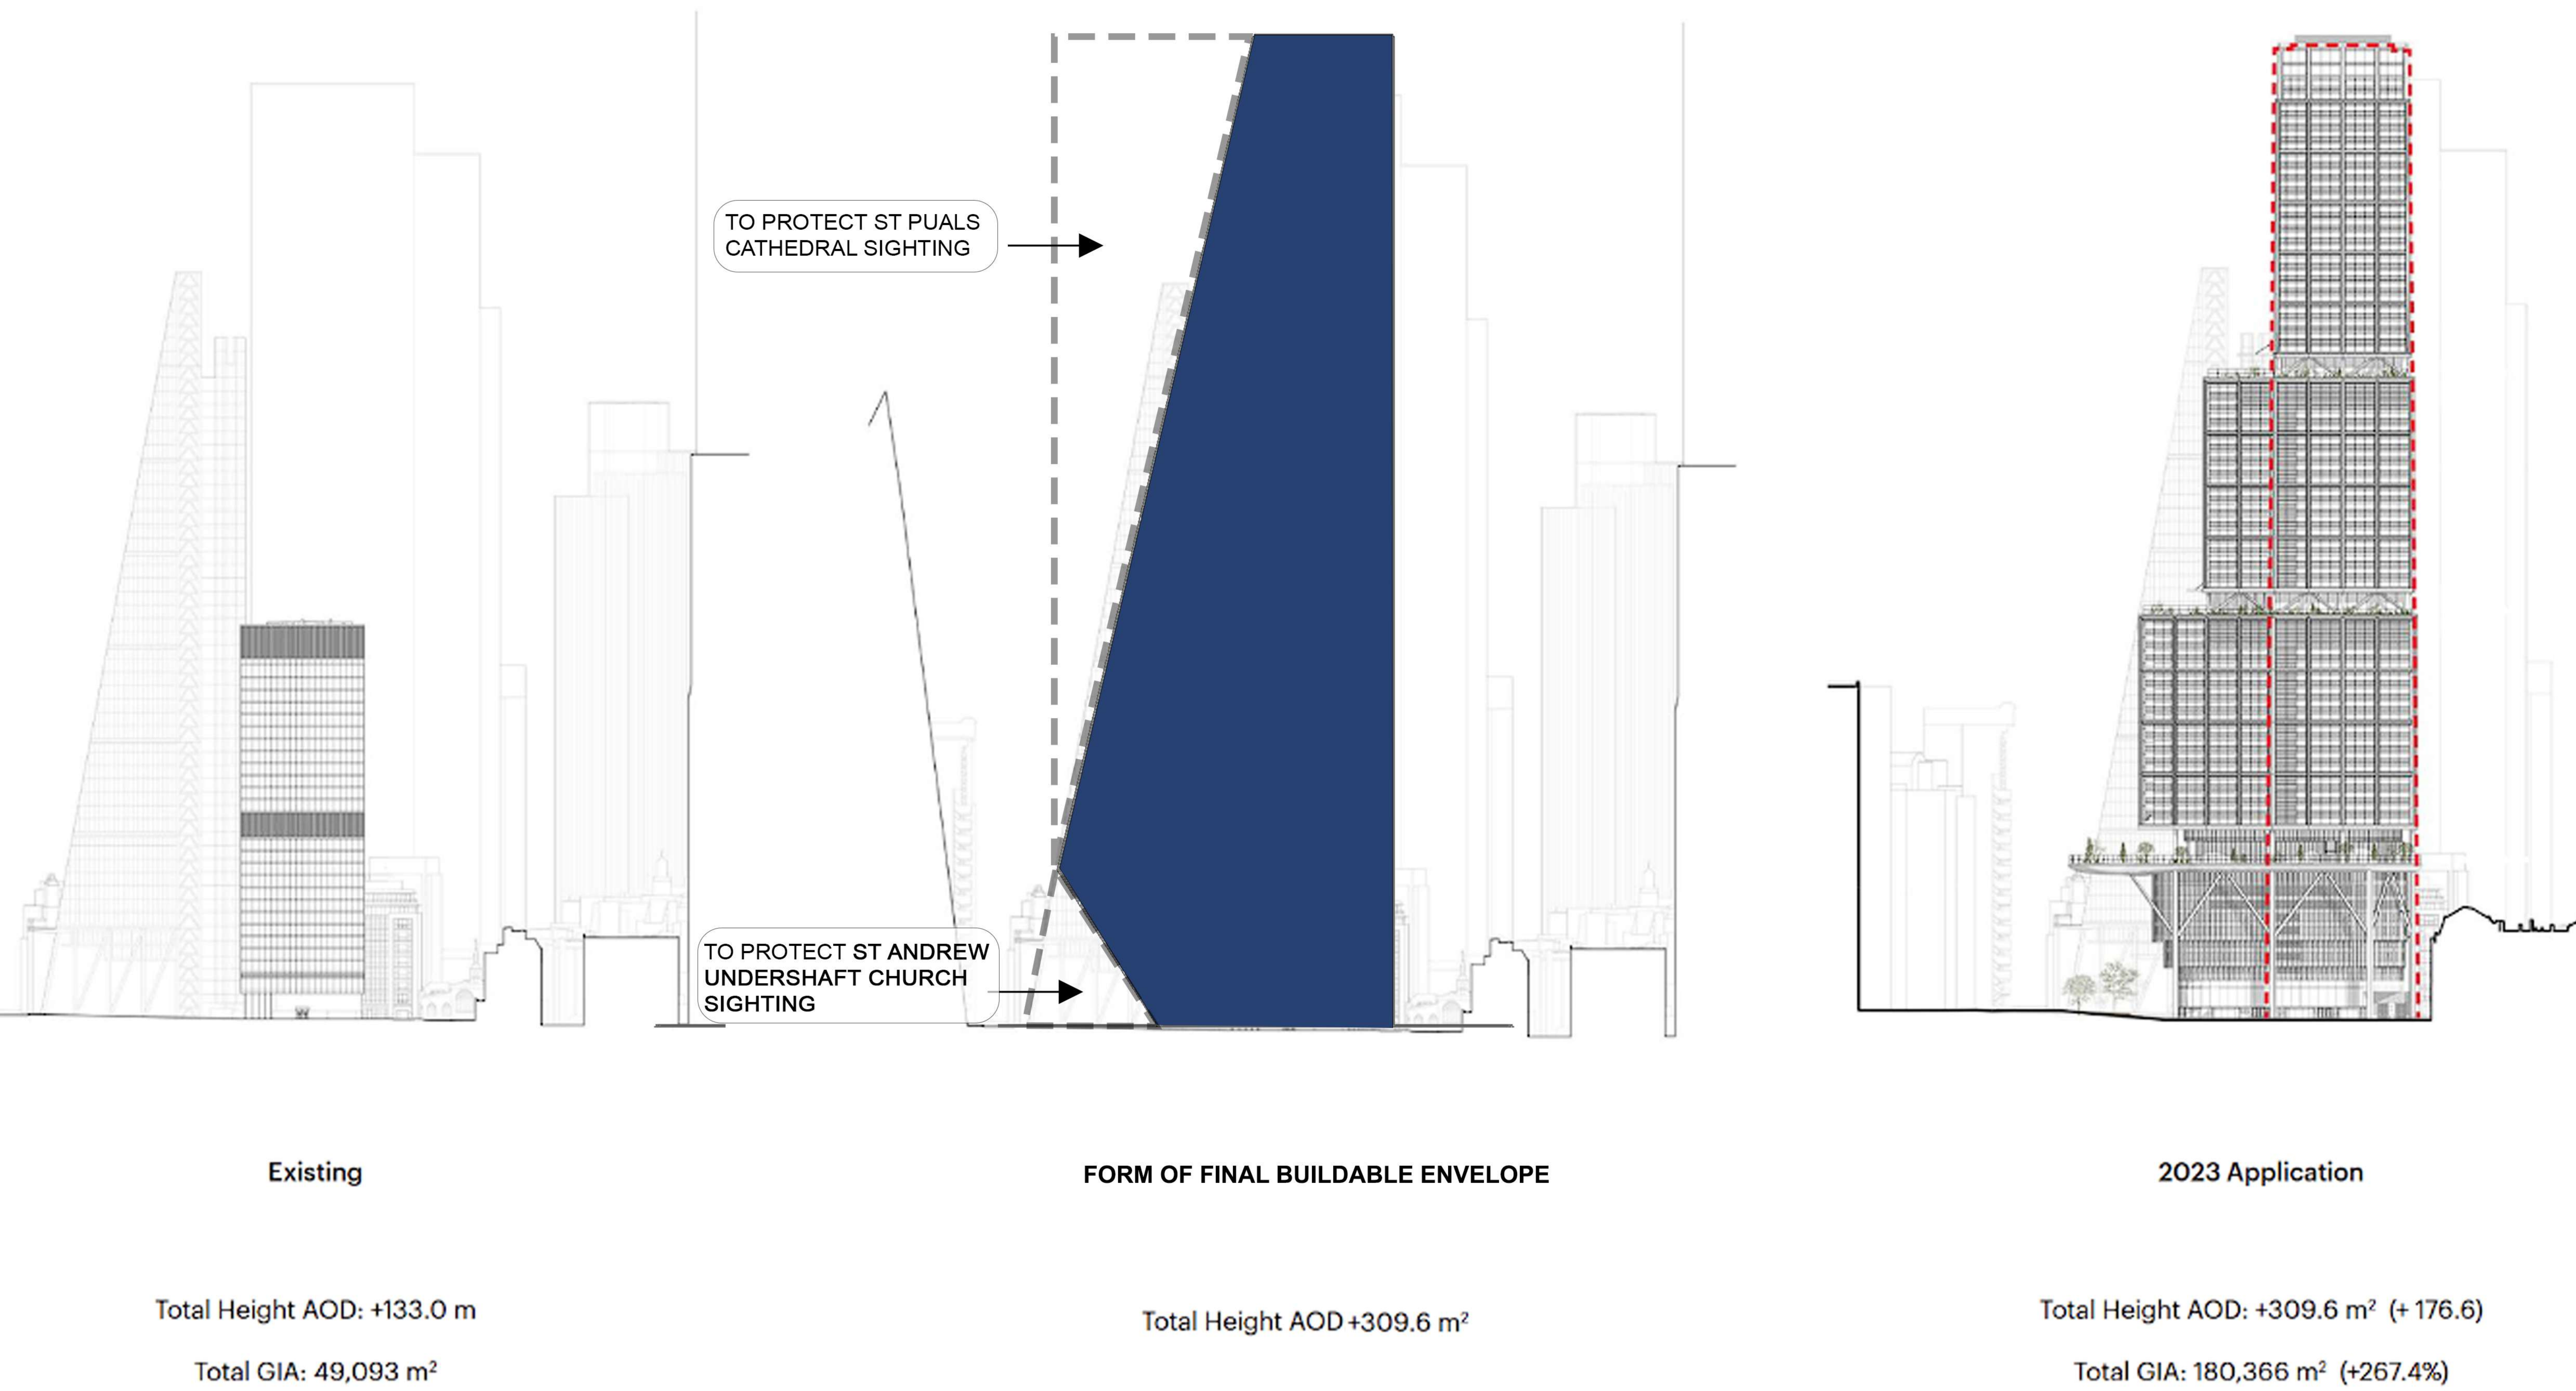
to 54. Figuring out the right of light envelop from the proposed elevation of proposed one undershaft (City of London Planning Portal, 2023)
